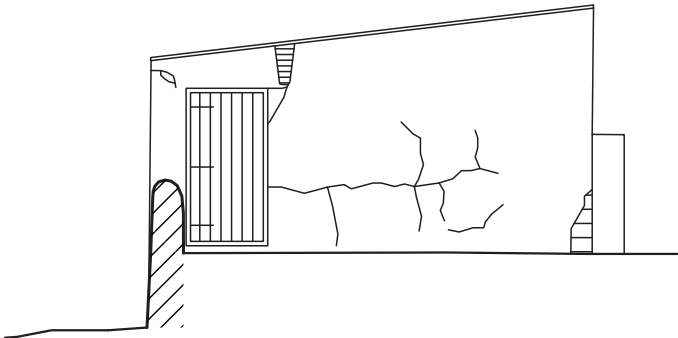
South-west elevation, Room G2 of Outbuilding 1, viewed from the north
